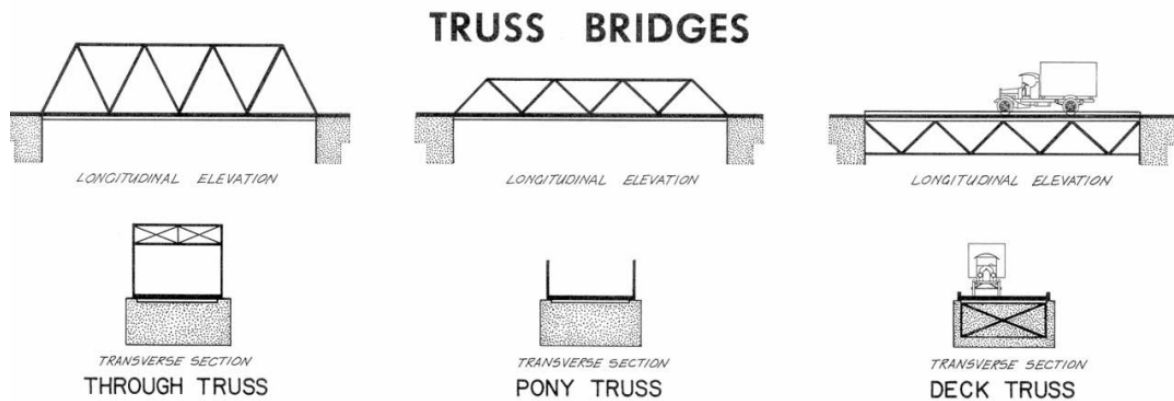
Truss Bridges Identification: Nomenclature (Jones, 1976)
